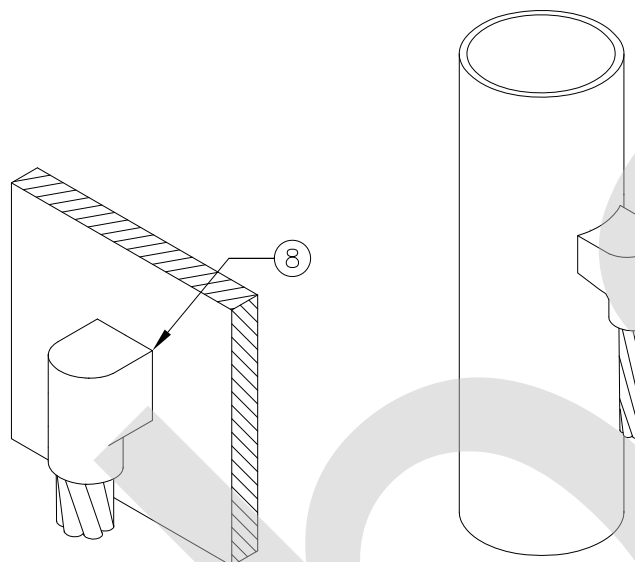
E – VERTICAL THROUGH WIRE TO A VERTICAL STEEL SURFACE.
